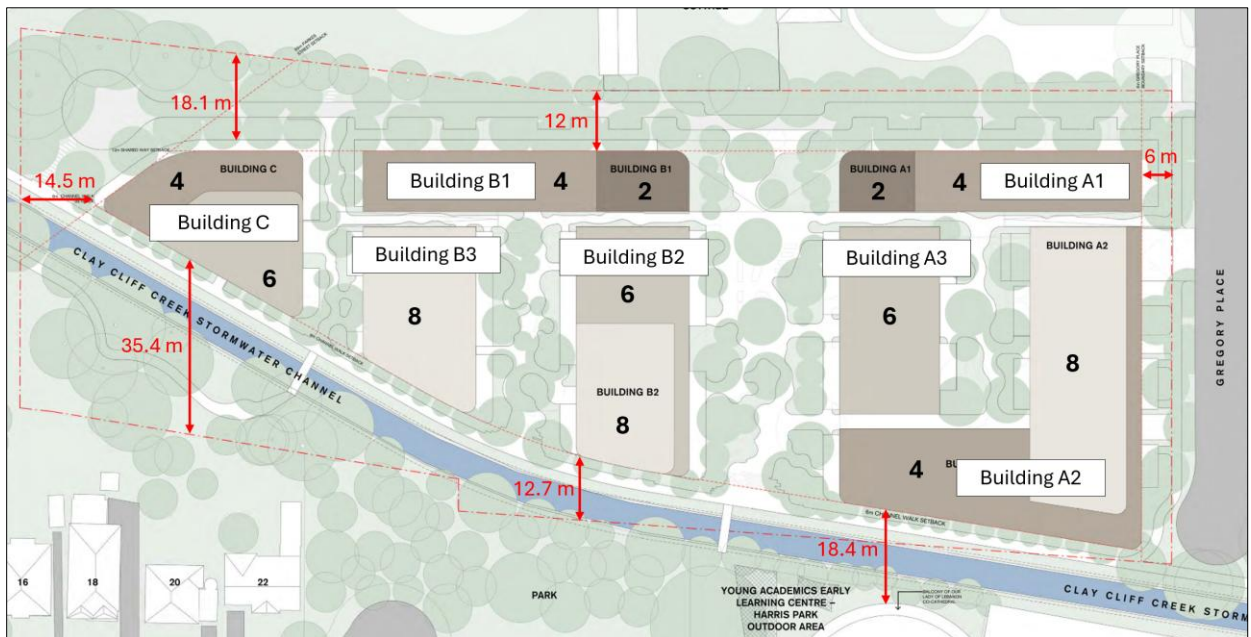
| Concept site layout with number of storeys and setbacks labelled (Source: Applicant's Amendment Report)
